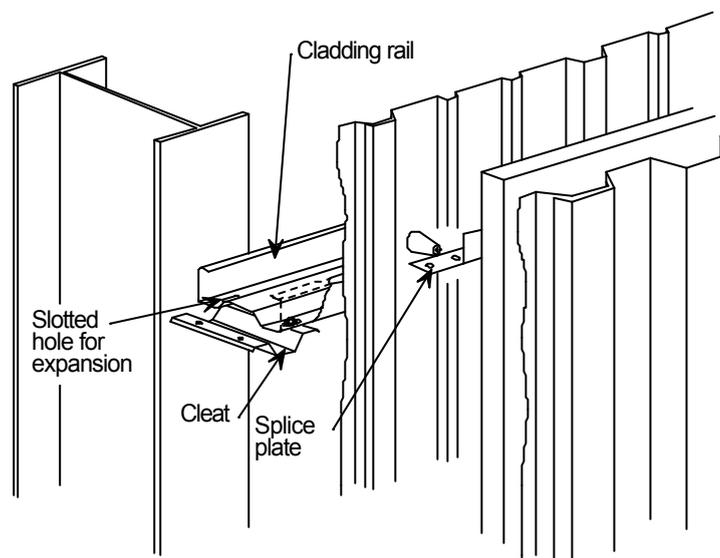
Typical fire wall details showing slotted holes for expansion in fire
